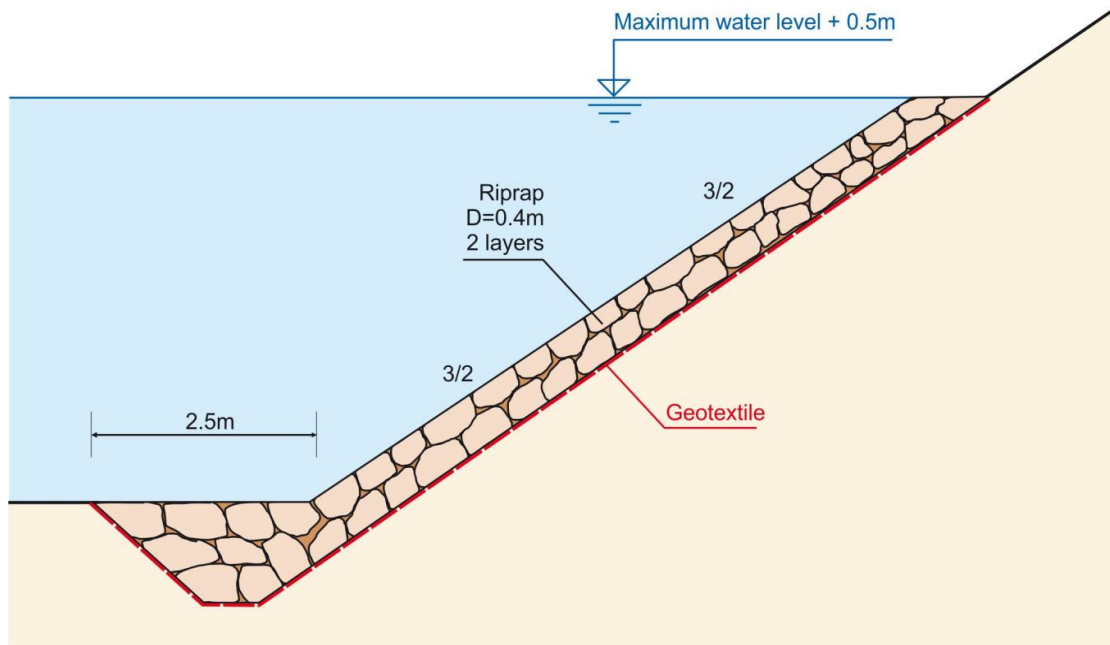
Standard cross section of the embankments protections of the Fond Saint Jacques streams
